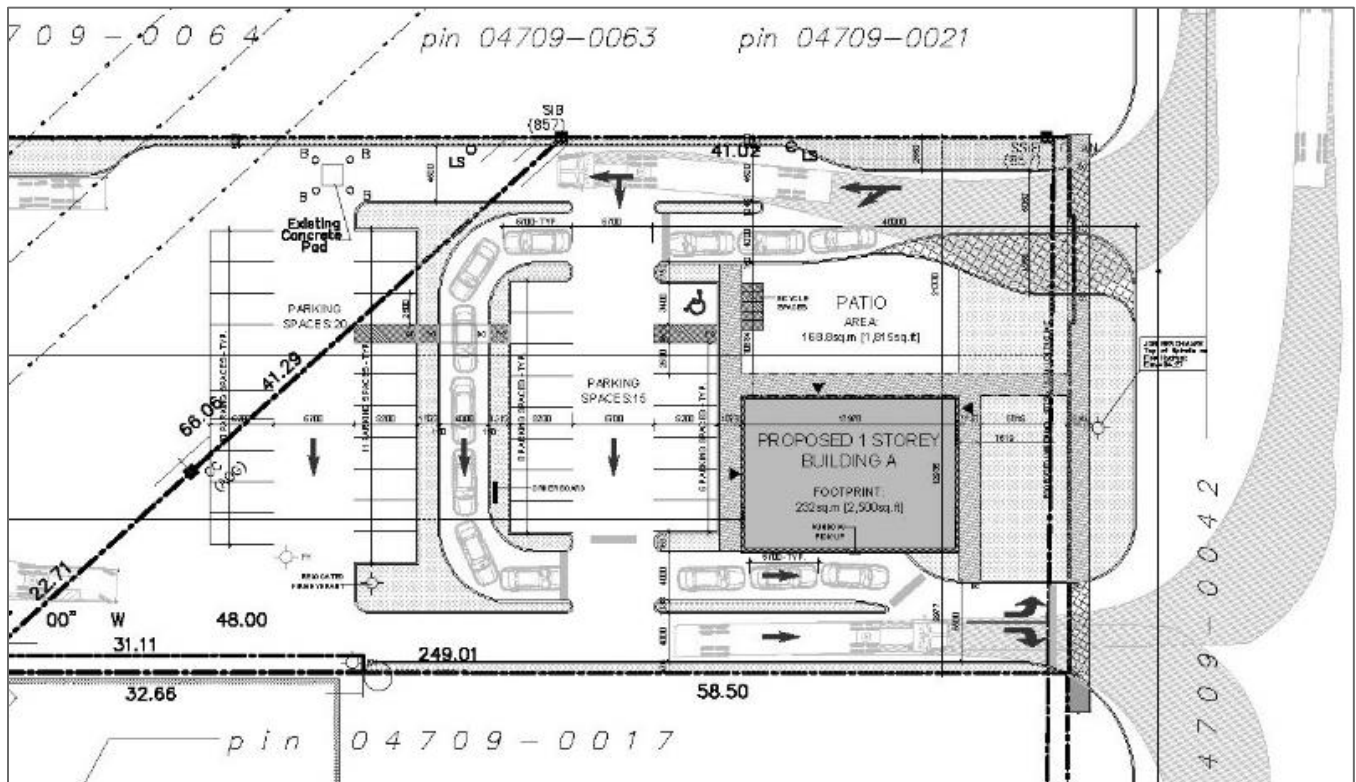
Snapshot of the Site Plan Showing the Drive-Through Restaurant
